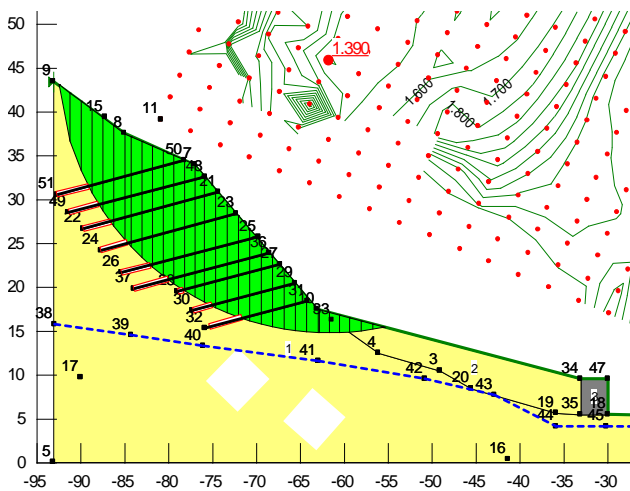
Proposed stabilization with soil nailing subsurface drainage and toe wall
